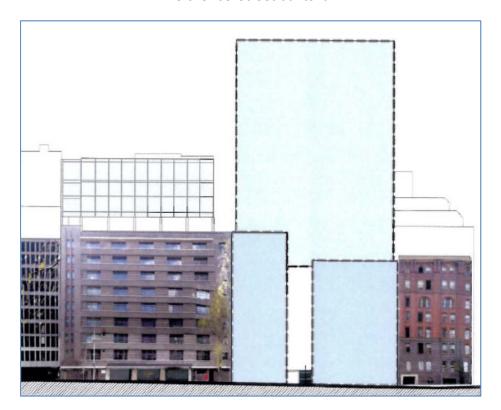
The approved Stage 1 building envelope for the site as viewed in its Kent Street context
